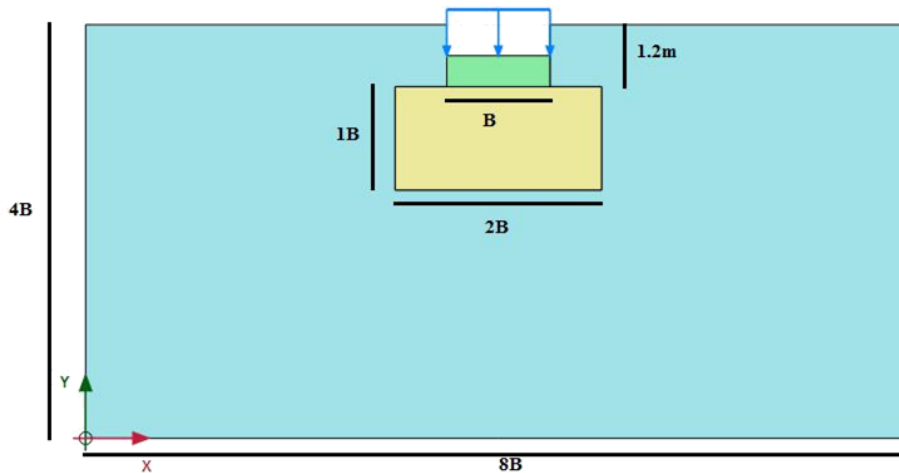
Strip footing resting on stabilized zone of depth 1B and width 2B (Case II)
